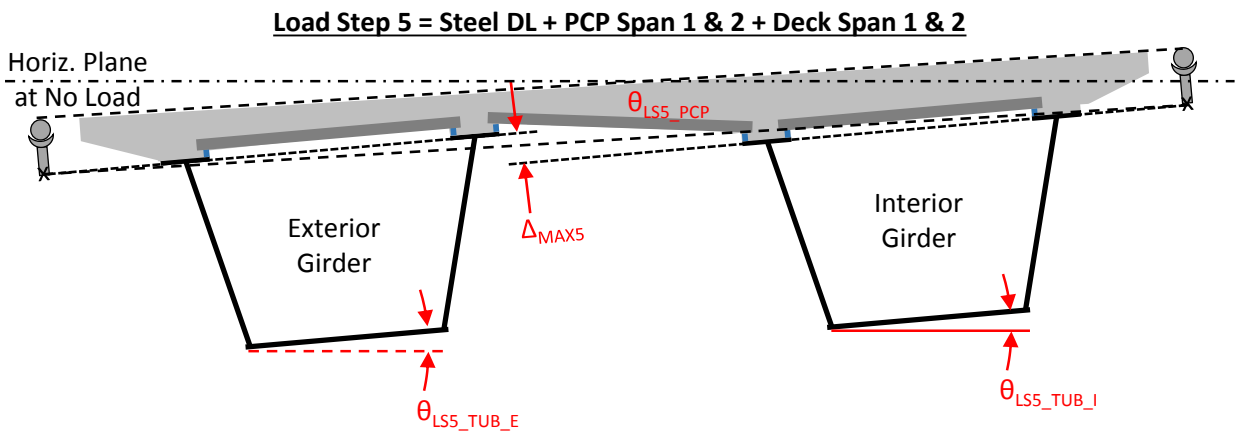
Load Step 5 – Unconnected Steel Tub Girder Twist – Section A-A
